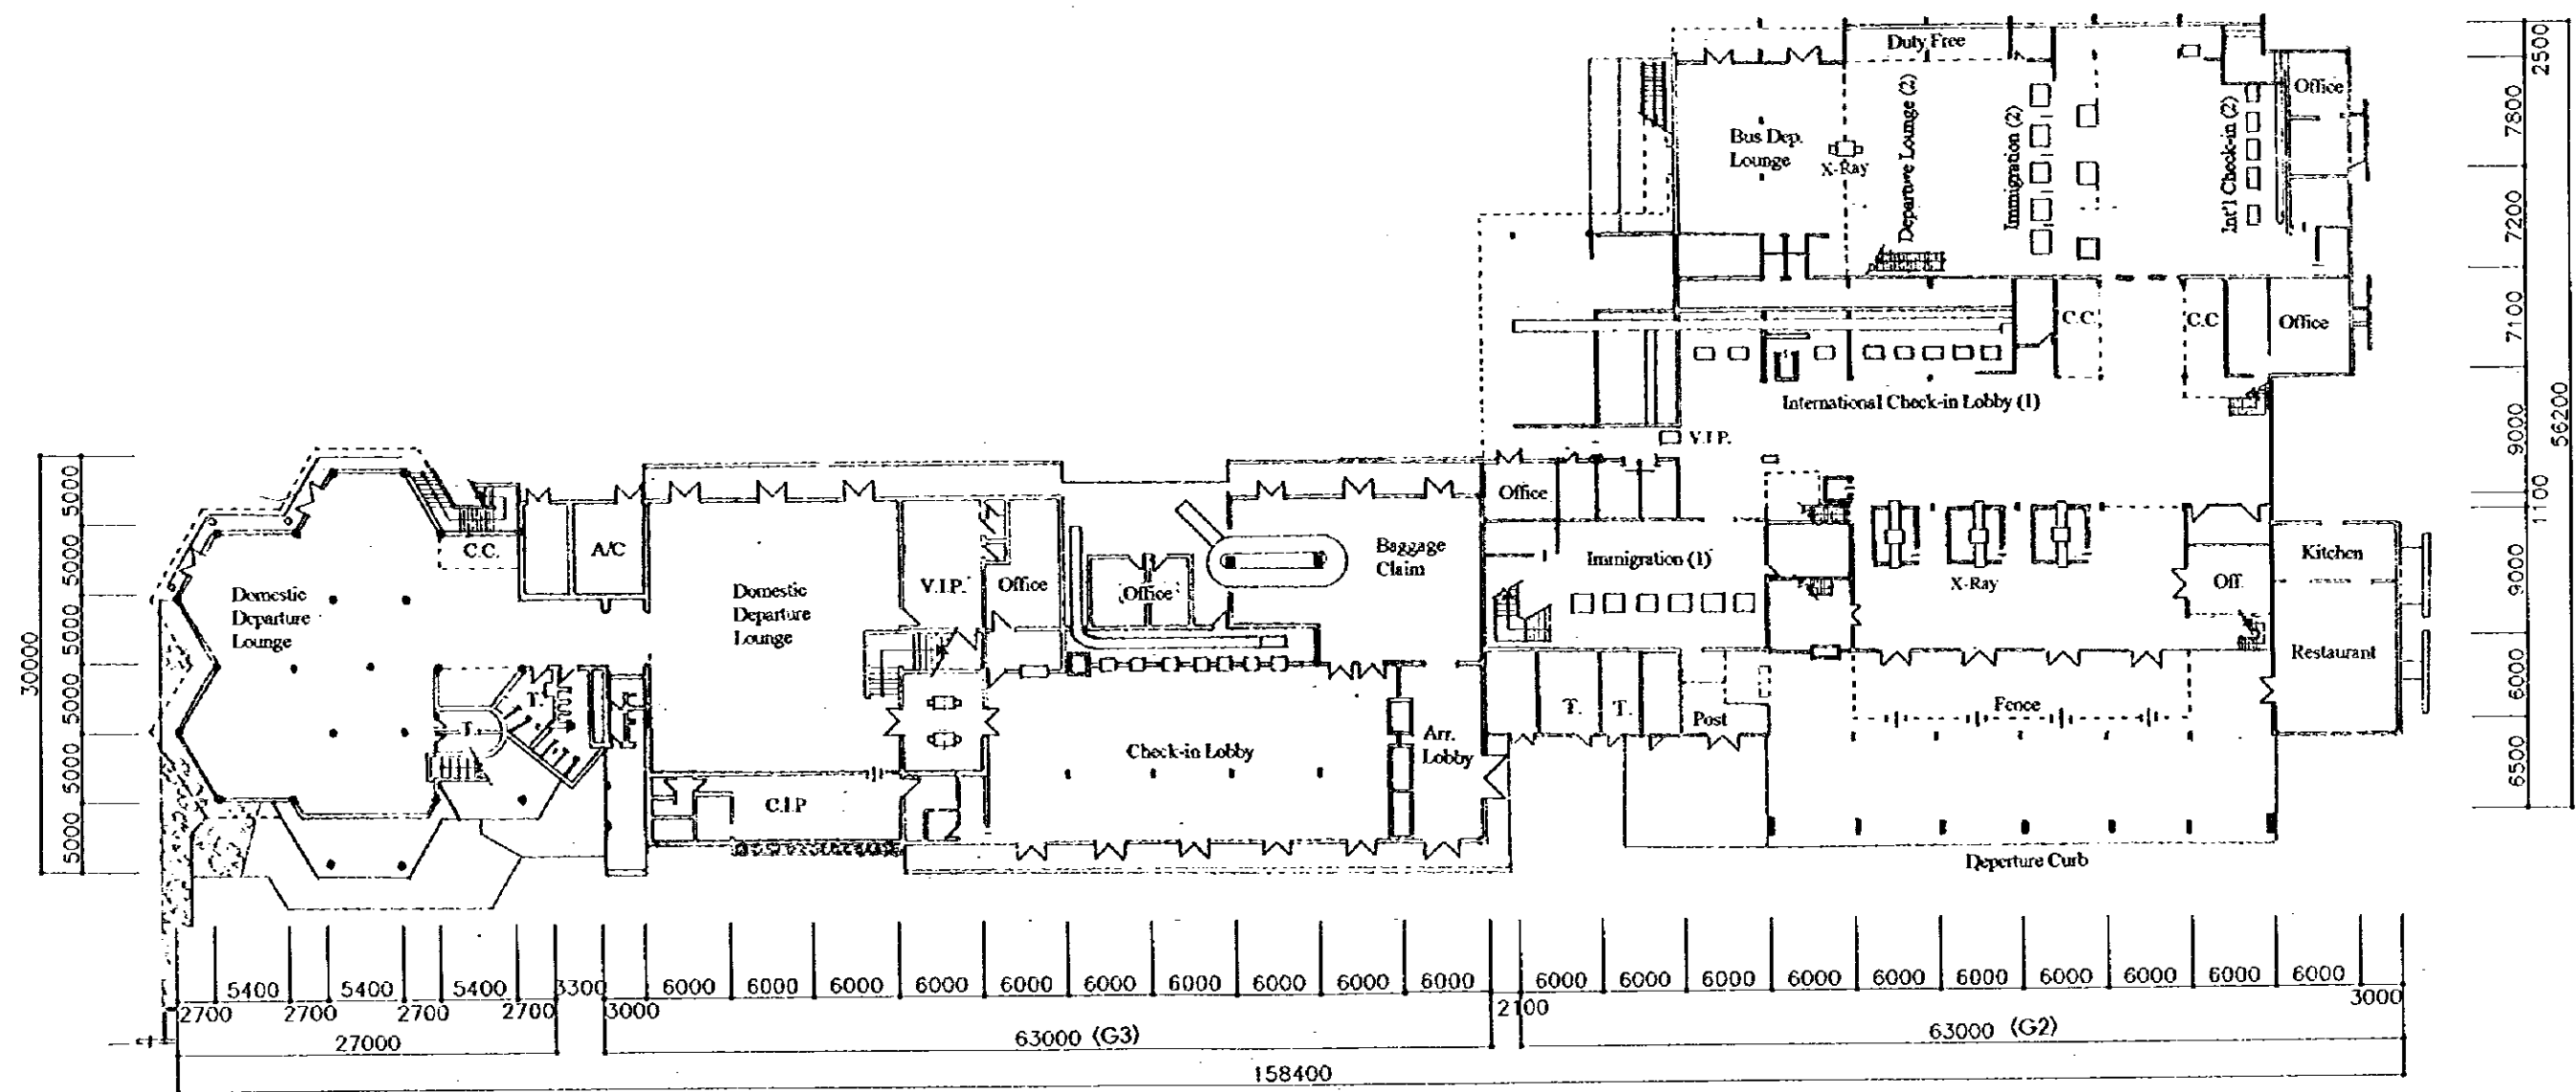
G2, G3 and Lounge Buildings - First Floor
